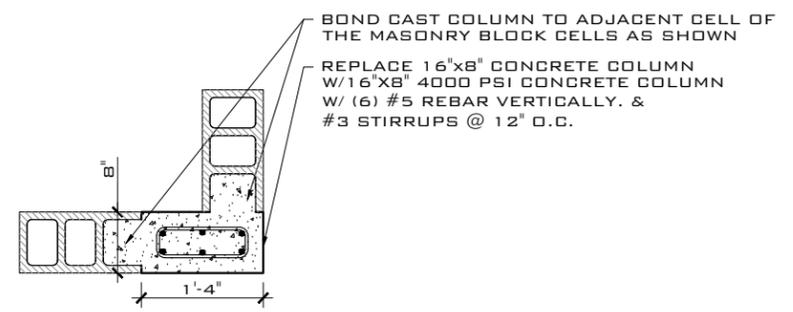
TYPICAL 16" DEEP COLUMN REPLACEMENT FOR LOCATIONS 1,2,3,4,18&19 (DIMENSION VARIES)
